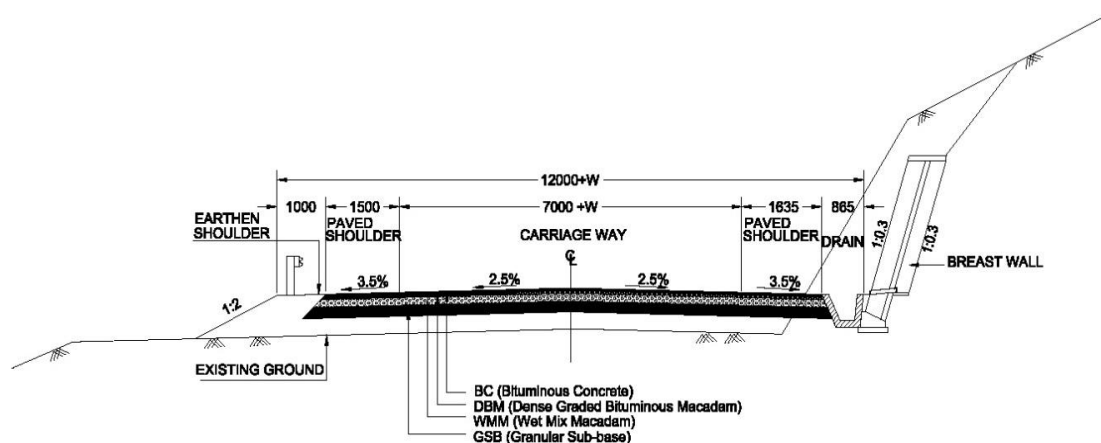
(1): Typical Cross Section for Widening Primarily to Hill Side
